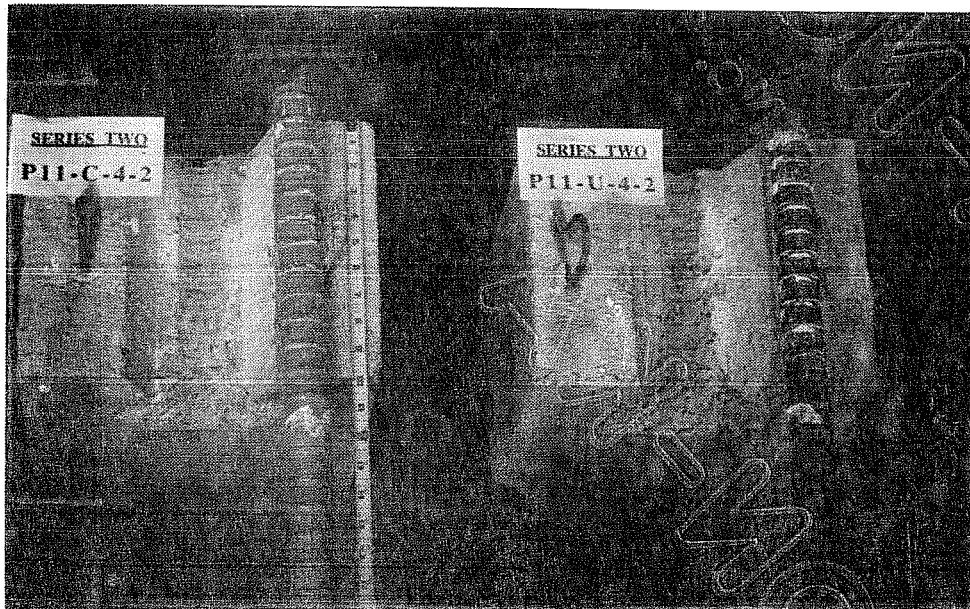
Parallel deformation pattern #11 bar Type A pullout specimens after failure, top load = 10 kips, normal strength concrete.
